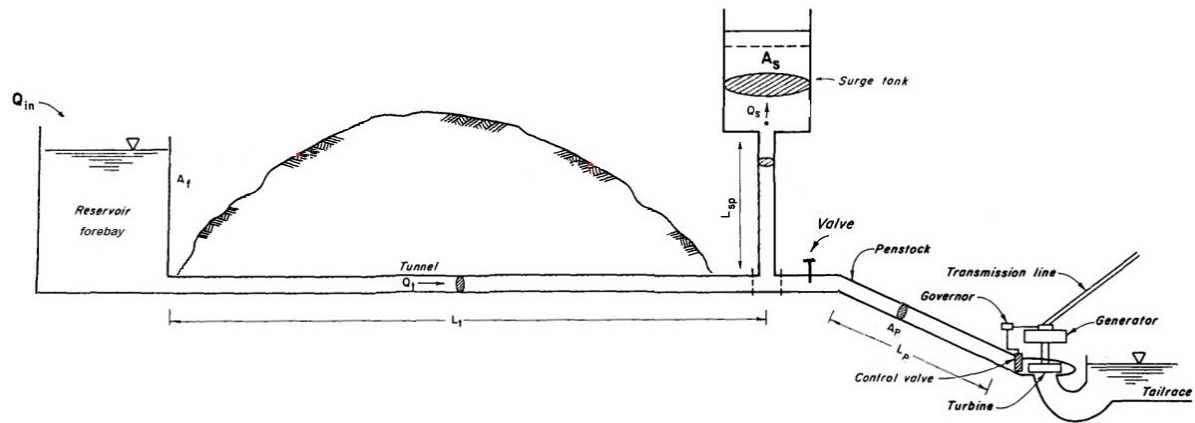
Bajo Tuluá ROR Hydropower plant scheme adapted from Chaudhry (1979)
